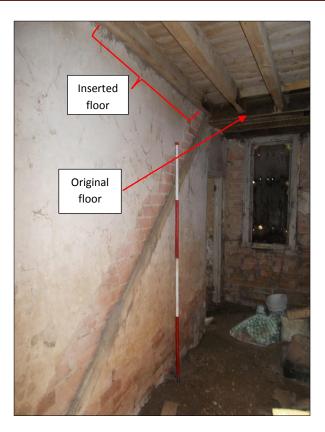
The former stairwell, looking west. Note timber string batten to left. 2m scale rod.
